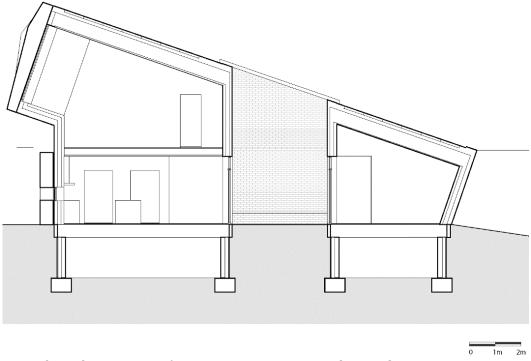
Cross section of the ZEB pilot house Larvik. Source: Snøhetta.
